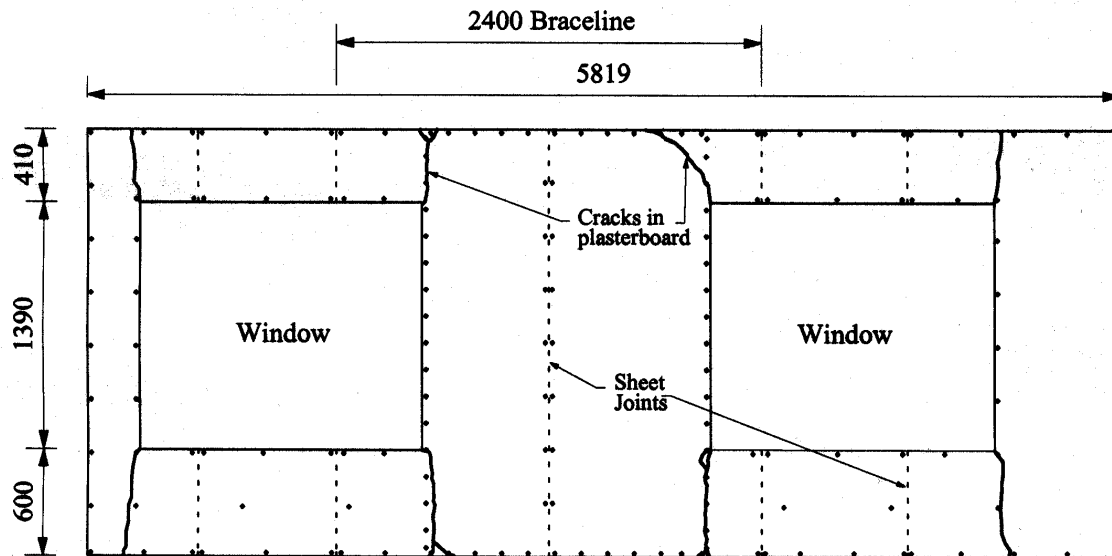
Plaster board cracks formed in the East Wall (Wall1)
